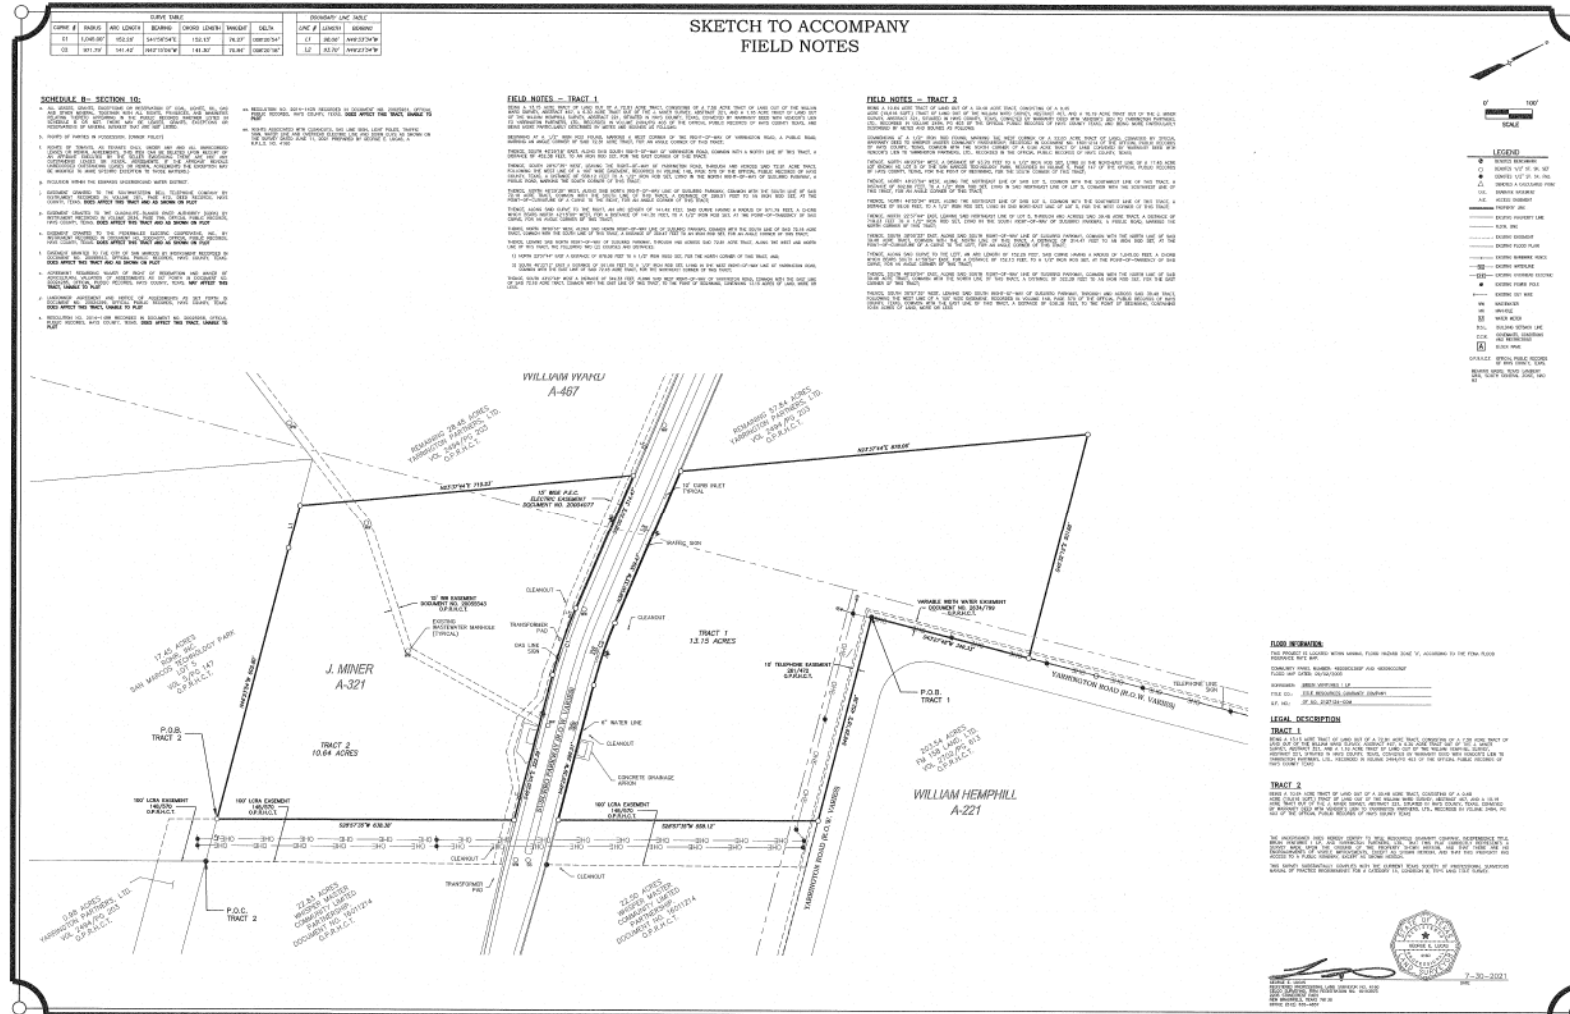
SITEPLAN OF PARCEL 1B
